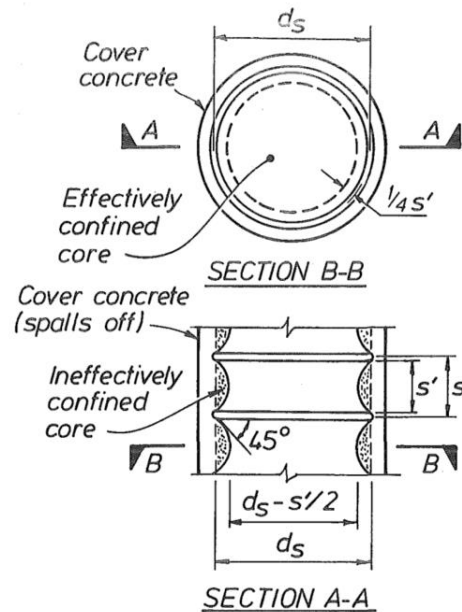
Area of confined concrete by circular hoop stirrups or circular spiral stirrups (Mander et al., 1988).
